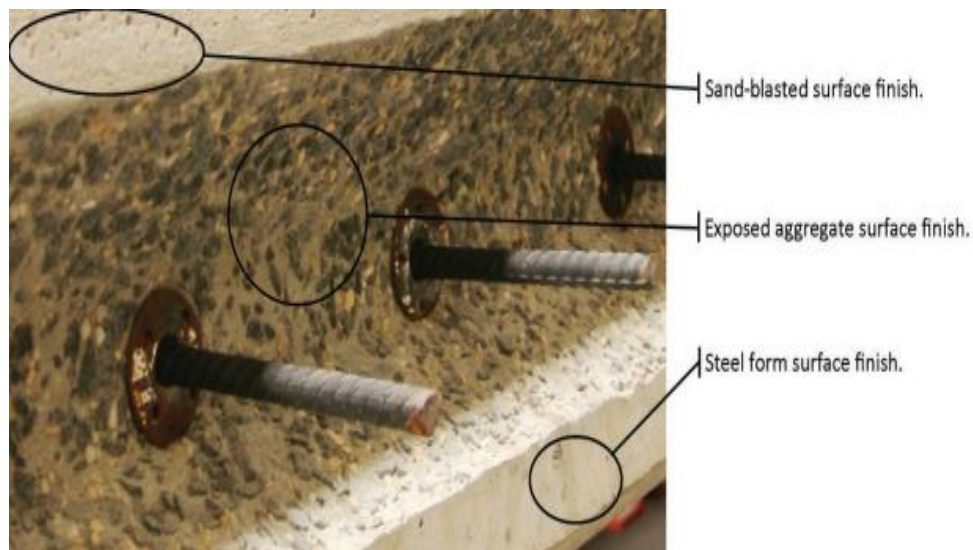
Exposed aggregate surface finish on a precast concrete component (Graybeal 2014)
